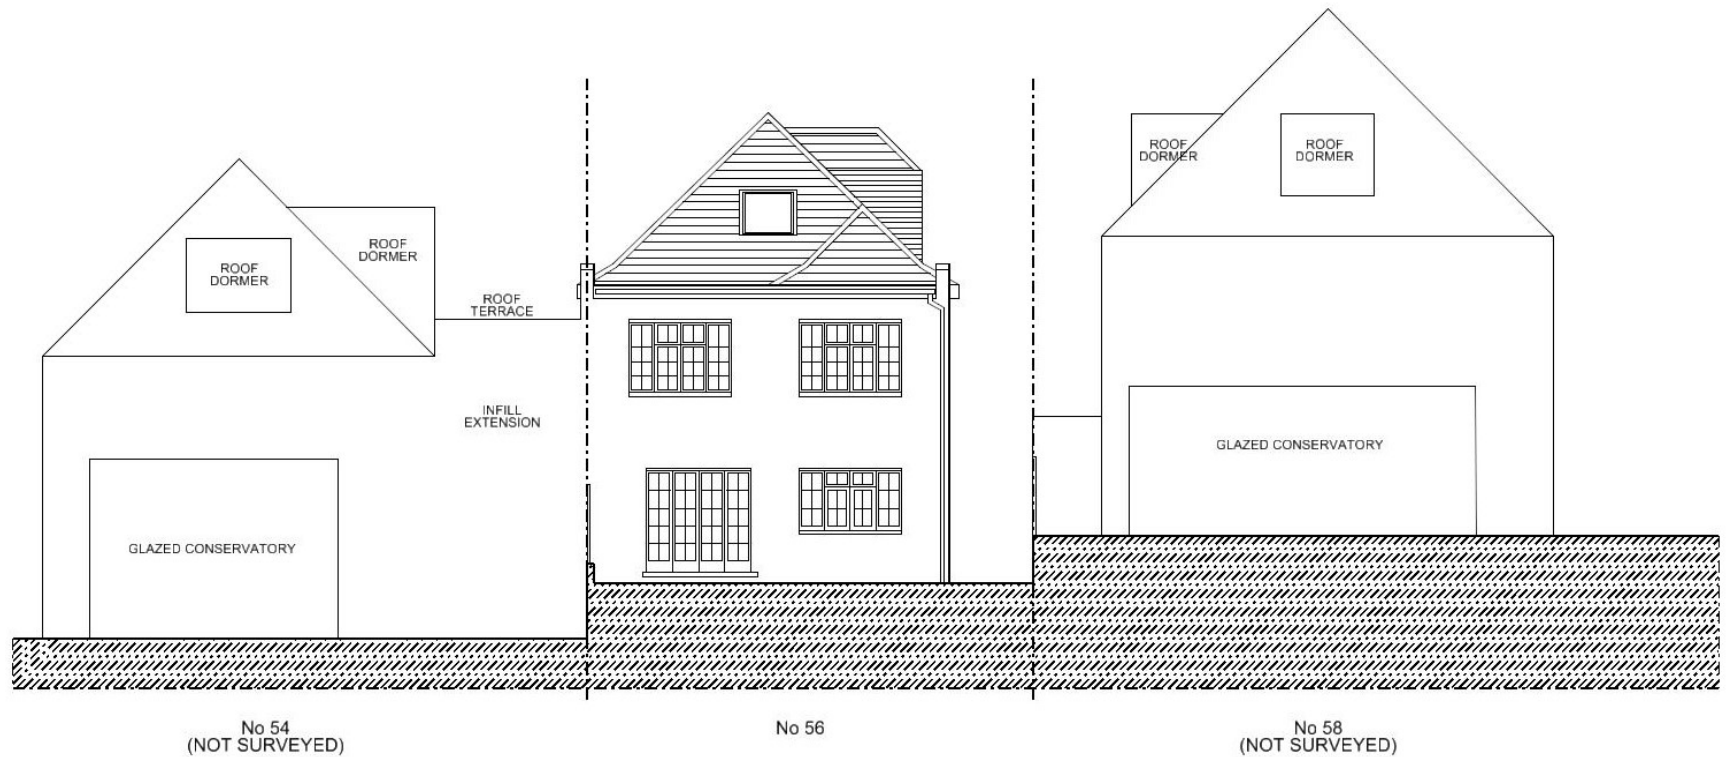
Garden (rear) elevation showing stepping nature of site.
